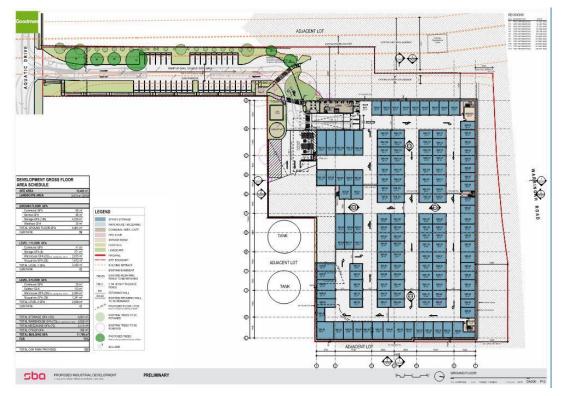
Proposed Development Layout (Ref. SBA Drawing DA200_P11)
